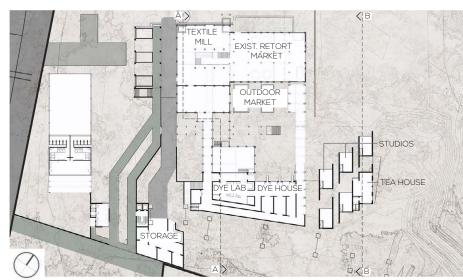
Iteration 5 Ground Floor Plan - June crit (Author 2017)
